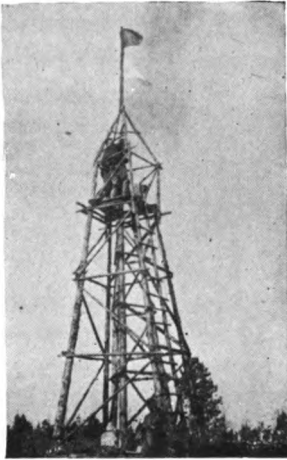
Twenty-five-foot Tower built of Green Poles.
